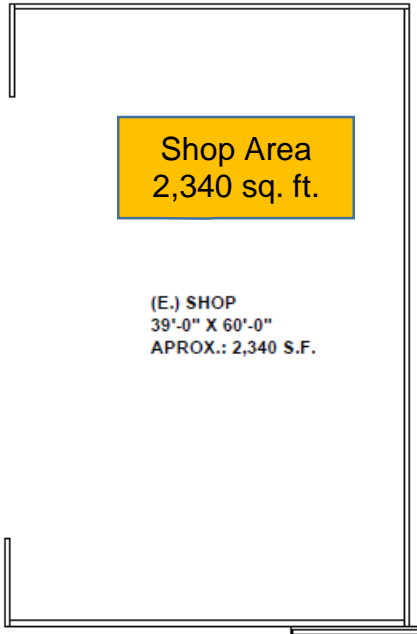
EXHIBIT D: Warehouse & Shop Building Floor Plans
